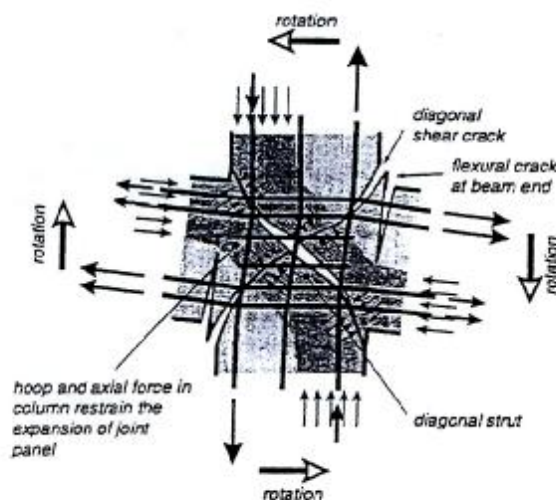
Behavior Model for Joint Shear Failure and Force Flow in Beam-Column Connection
